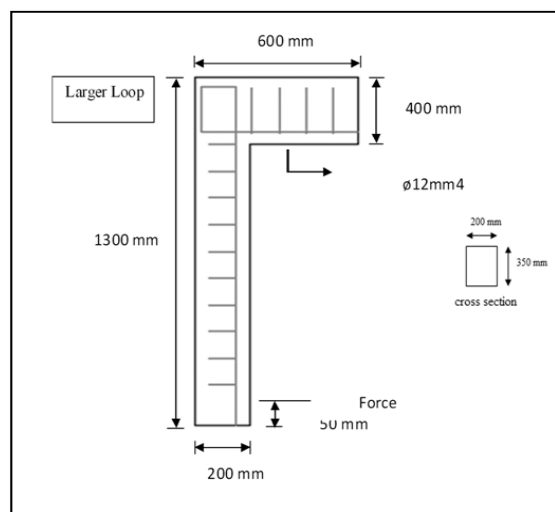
Large Loop Reinforcement Detail (LL2).^[9]
